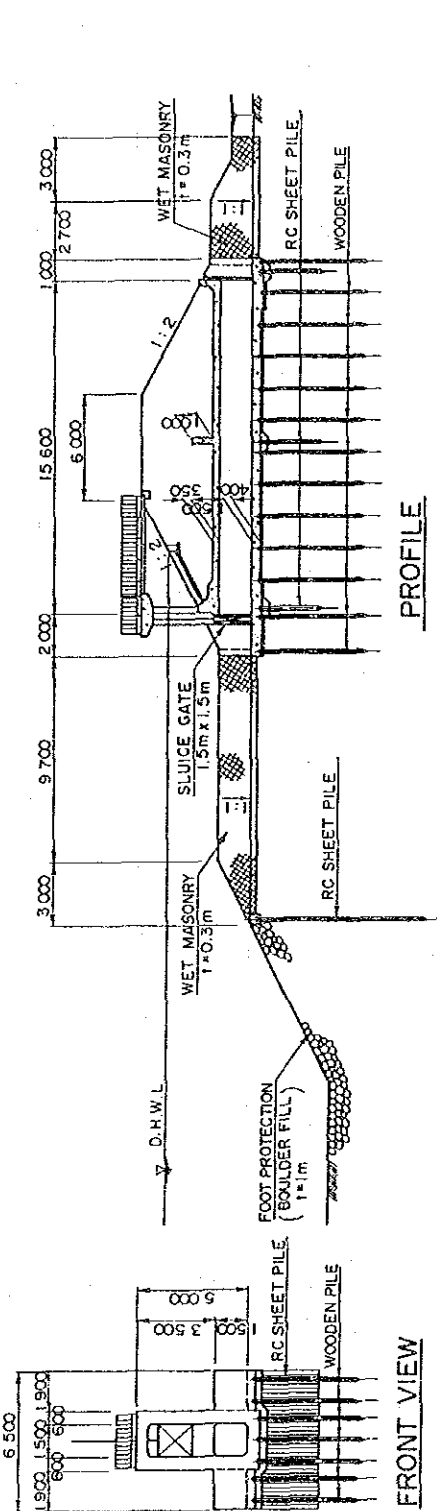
STANDARD DESIGN SECTION OF
